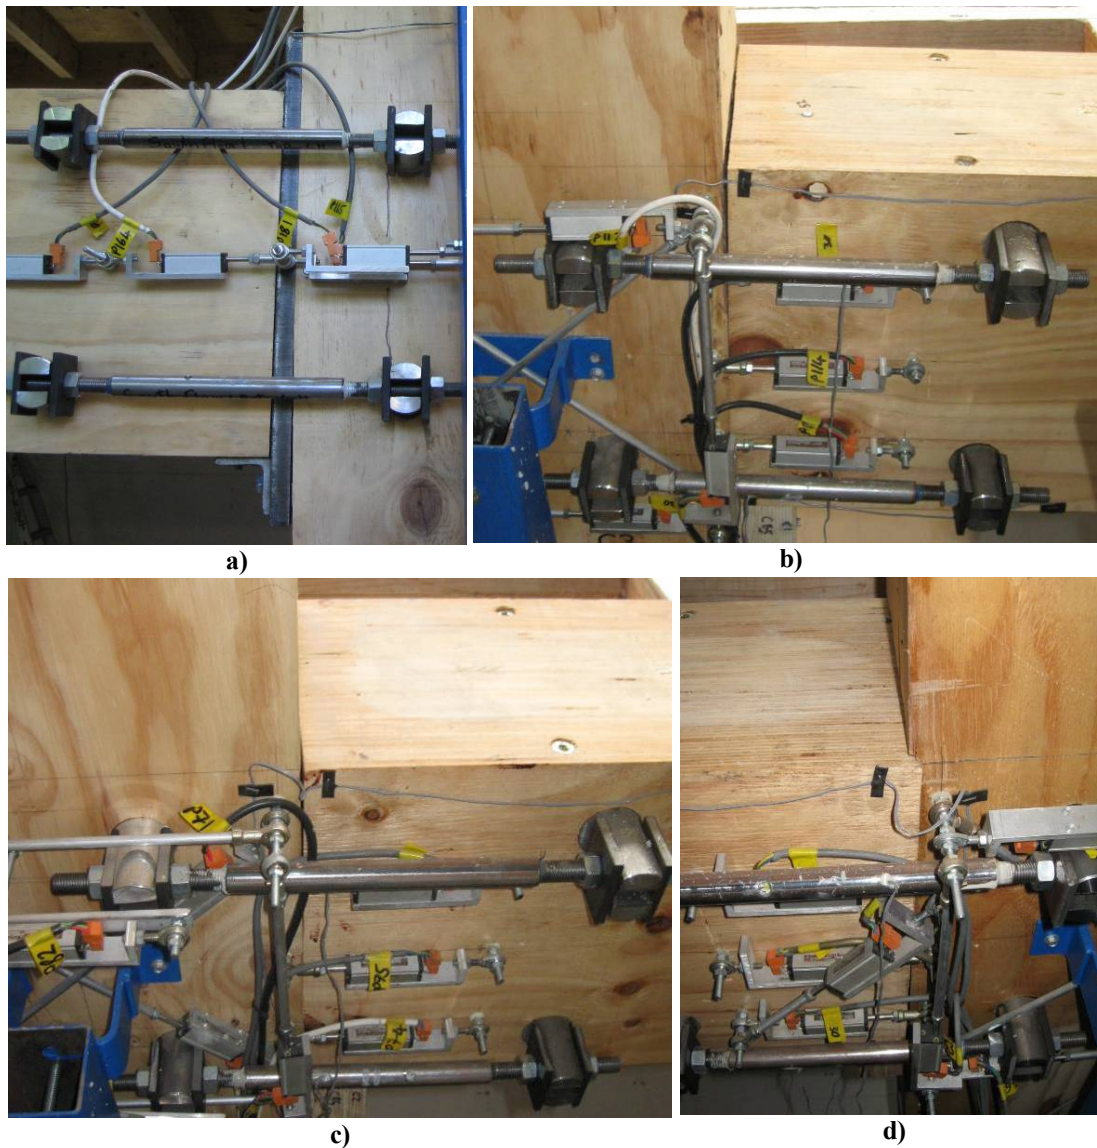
BC connection deformation at peak bi-directional Drift a) S column, L2 b) NE column, L3 c) N column, L3 d) NW column, L3
